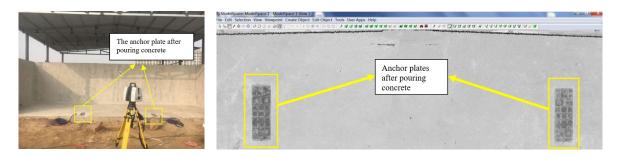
Scan anchor plate Figure 6b: Anchor plate point cloud after pouring concrete.
